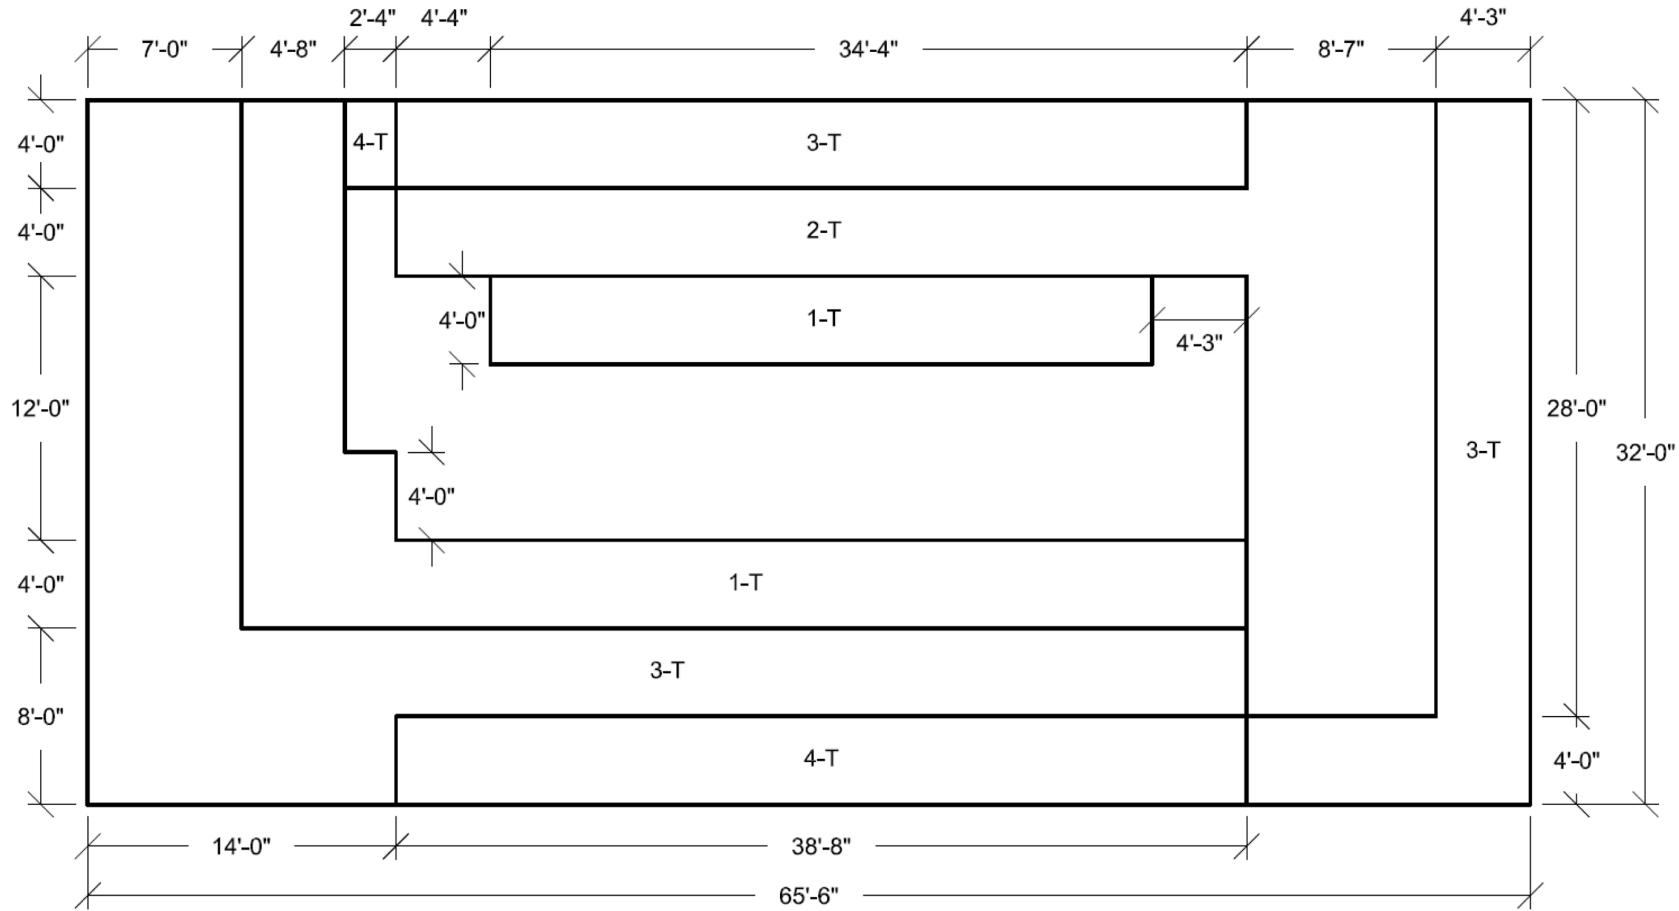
H.6-172 DGFO SV Wall 8 Looking From Outside Transverse Reinforcement Zones
